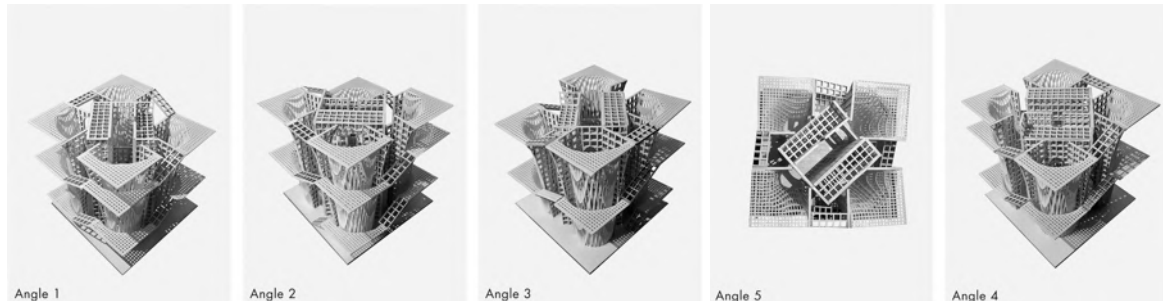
Proposal of a structure study as a 1/100 physical model (RC frame structure - wall type)
